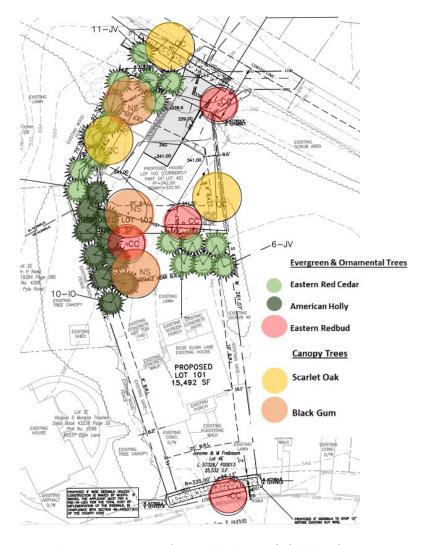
Tree-Save Plan – Mitigation and Planting Plan
